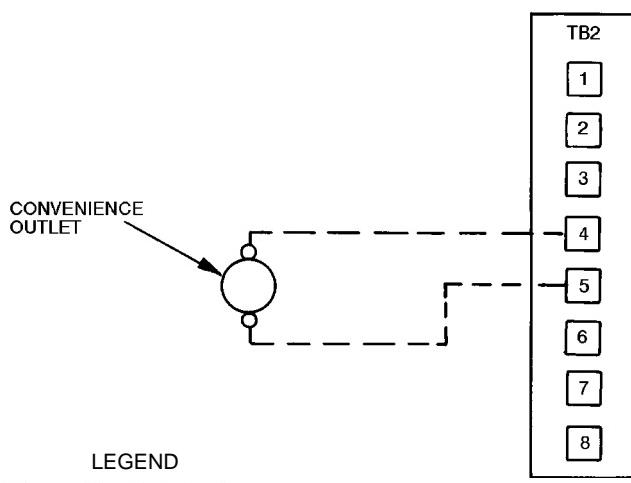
115-V Field Wiring, 50DJ,DW CV Units
